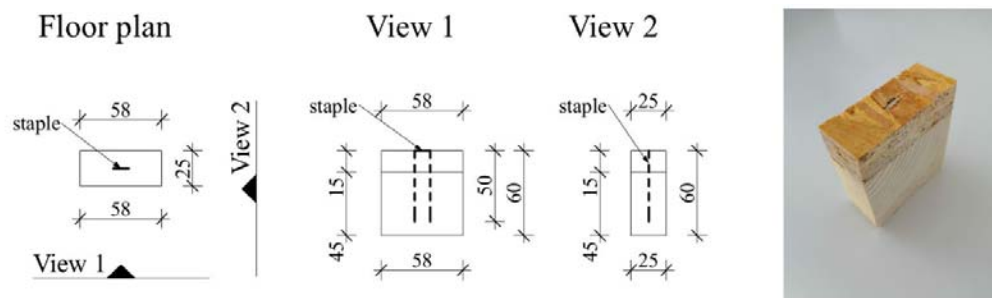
Dimensions and arrangement of the test specimen for performing the staple joint to pull out the staple.
